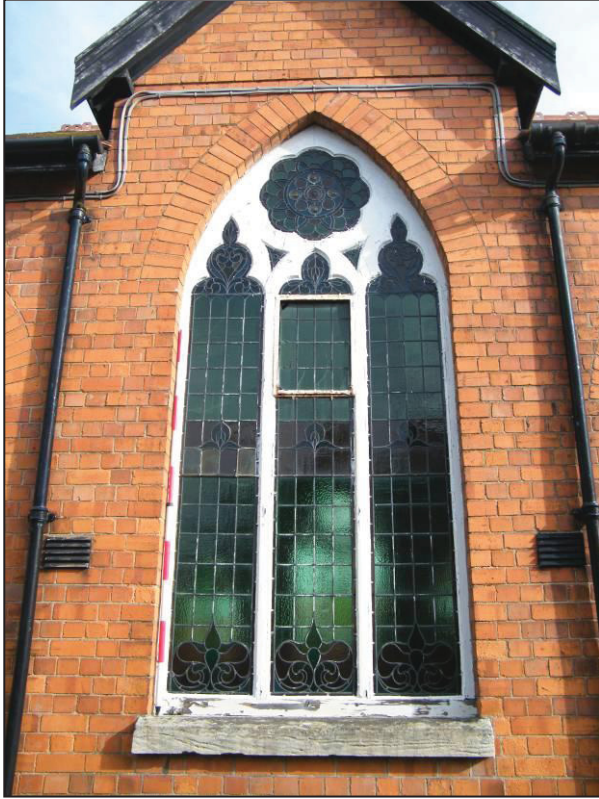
(Shot 17): Window in gabled bay on south elevation, looking north
